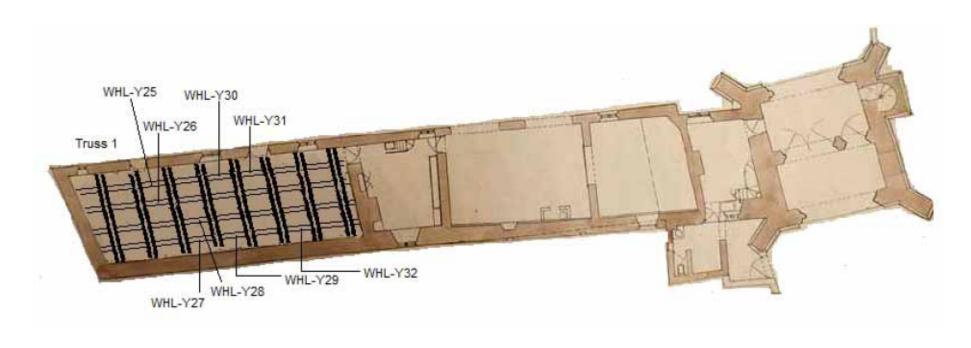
Plan of the Stables, showing the location of samples WHL-Y25-32 (Robert Martin, architect to Manchester Diocese (LA DRB acc 7633/37)
